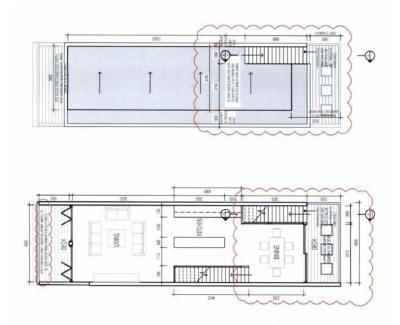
The endorsed first floor and roof plan of 33 Spensley Street permitted by Planning Permit PLN18/0101
